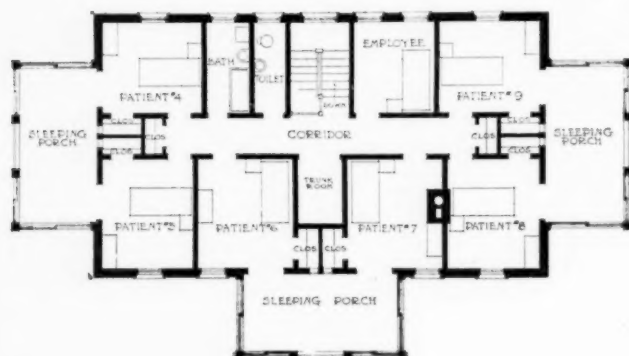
First floor plan of the Kerbs Memorial Cottage.
